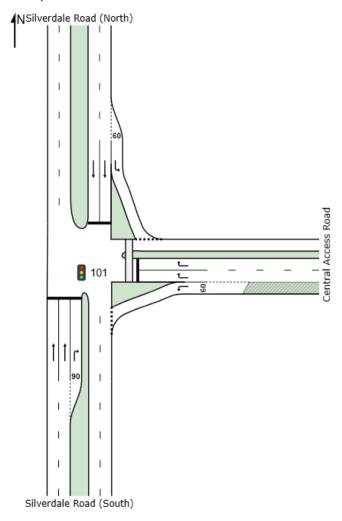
Silverdale Road / Central Access Road Intersection Geometric Layout
